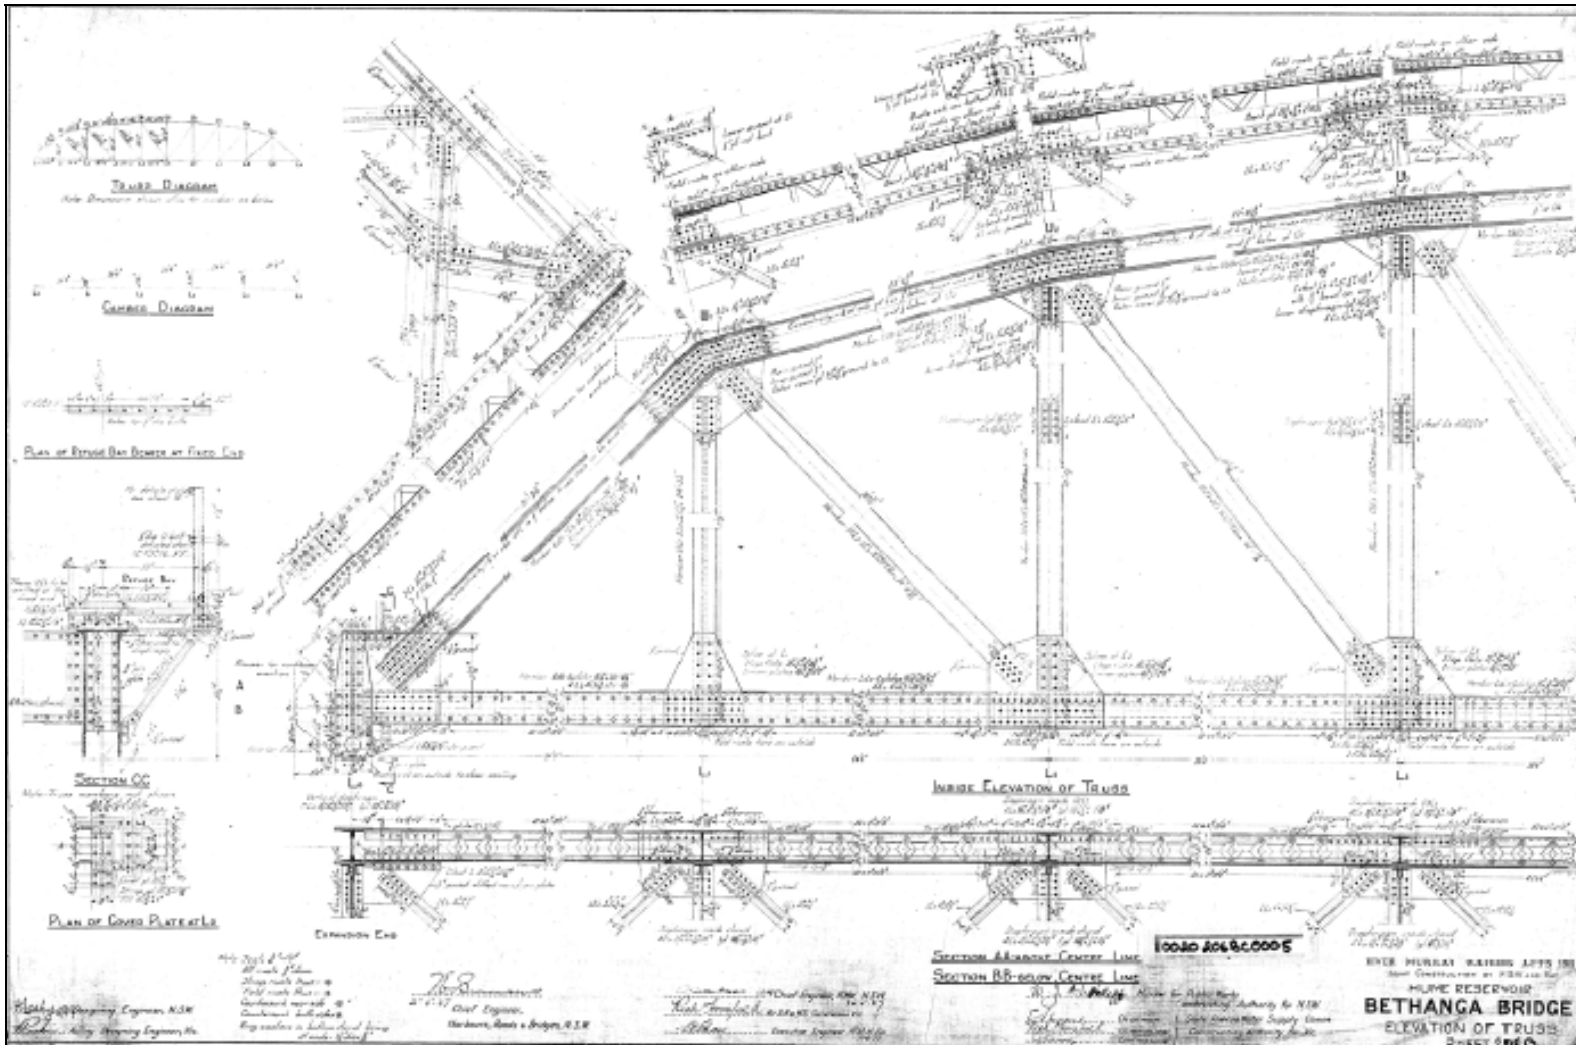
Details of Pratt Truss spans from the Bethanga Bridge design plans (RMS Archives).
